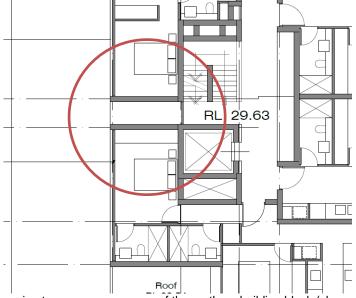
Window opening to common core area of the northern building block (shown at Levels 01 to 06)
